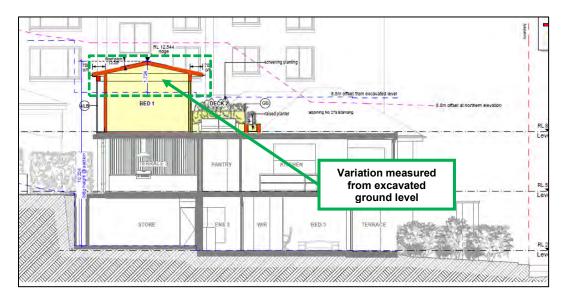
Long section drawing indicating extent of variation to upper-level bedroom addition
